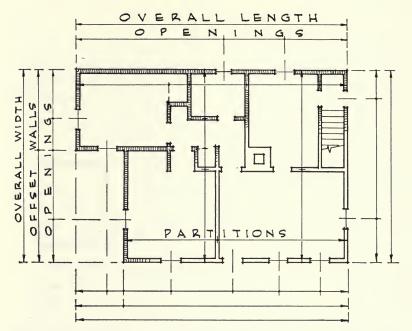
Dimensions needed on scaled drawings to enable builder to lay out the house.
